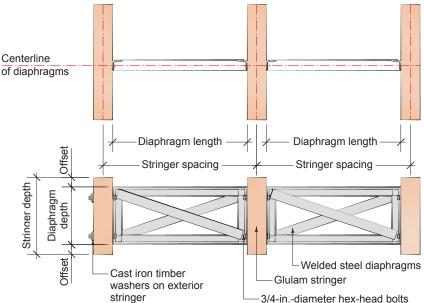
Glulam stringer bridge diaphragm details (When using longitudinal stiffeners, the offset distance should equal actual depth of stiffener. If longitudinal stiffeners are not used, offsets should be a minimum of 4 in. at the top and bottom of diaphragm).
